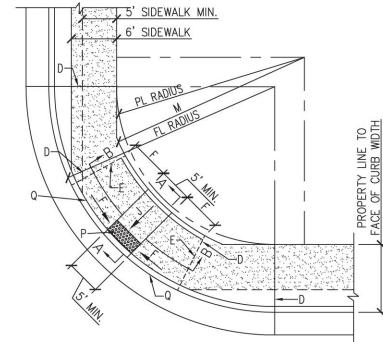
DETAIL A MINIMAL R.O.W. FOR SIDEWALK AT BACK OF CURB PERPENDICULAR RAMP
